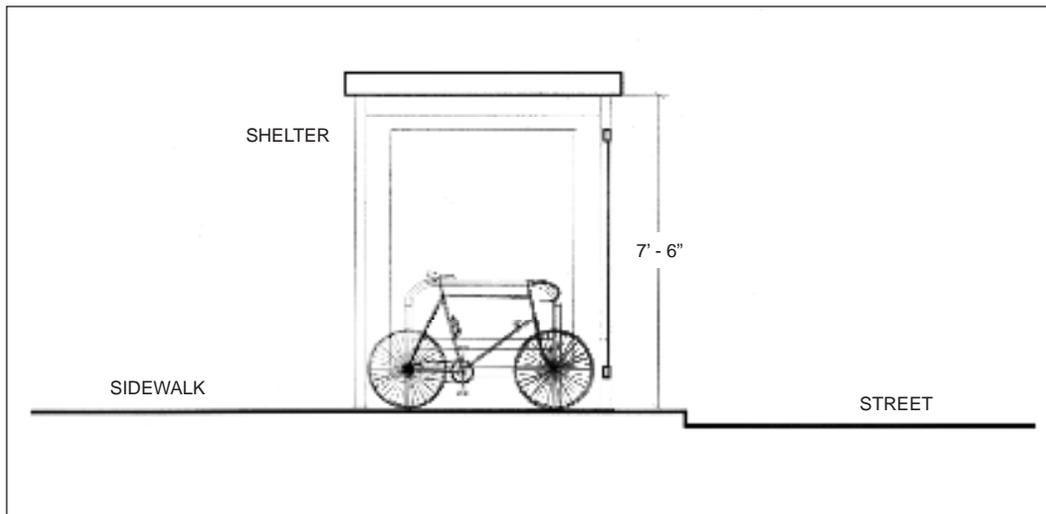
Section Through Proposed Curb Extension with Sheltered Bicycle Parking
